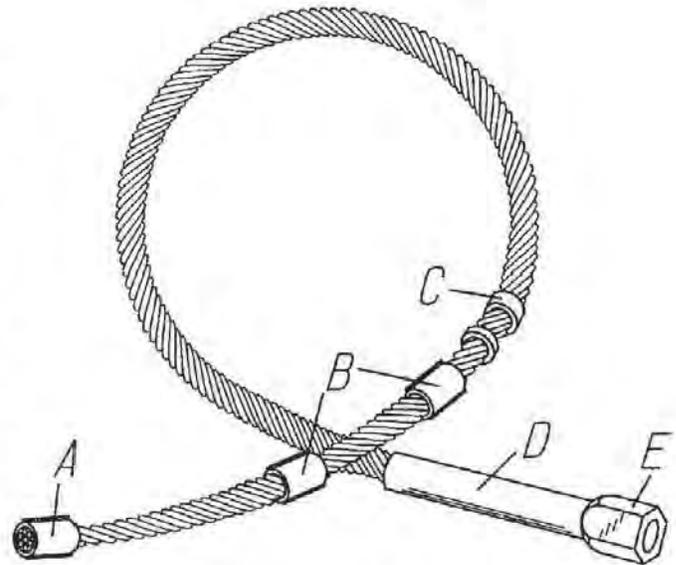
Specific components of a resin-grouted cable bolt. *A*, swedged-on fitting to tie all cable strands together; *B*, wedged-on buttons for additional anchorages; *C*, short button to hold plastic seal in place; *D*, cable stiffener rod; and *E*, installation head or cable nut.
